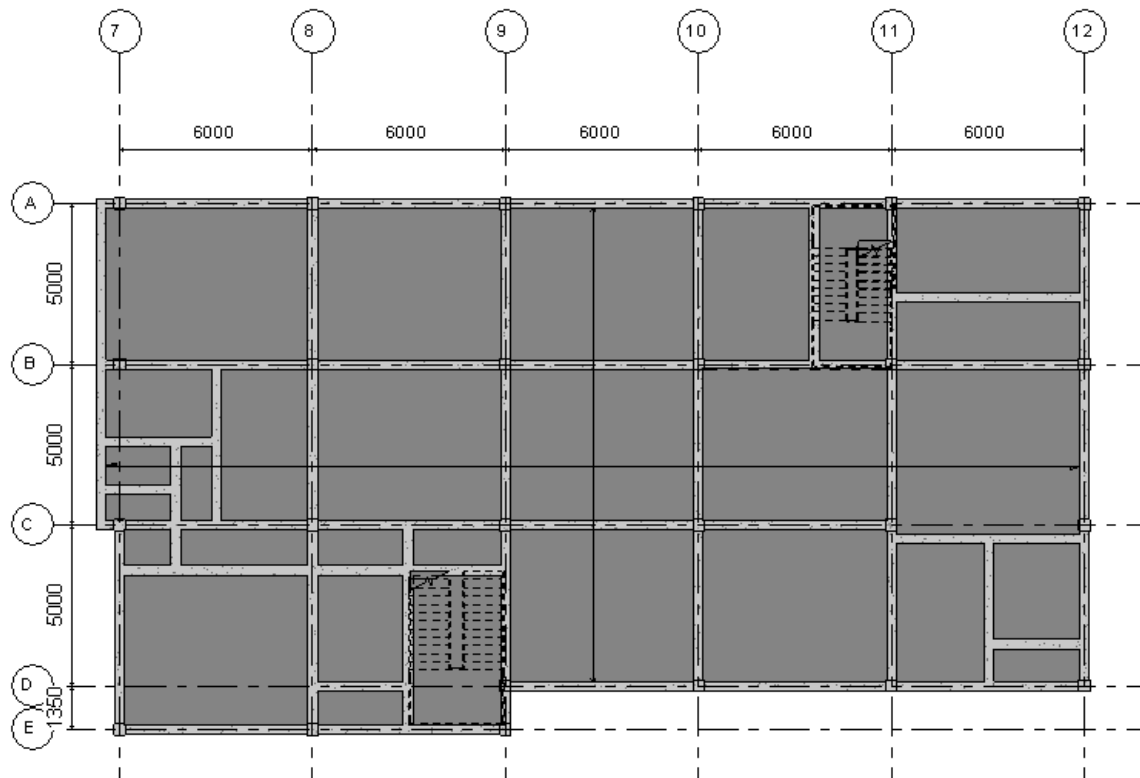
Typical Ground Beam and Slab layout
